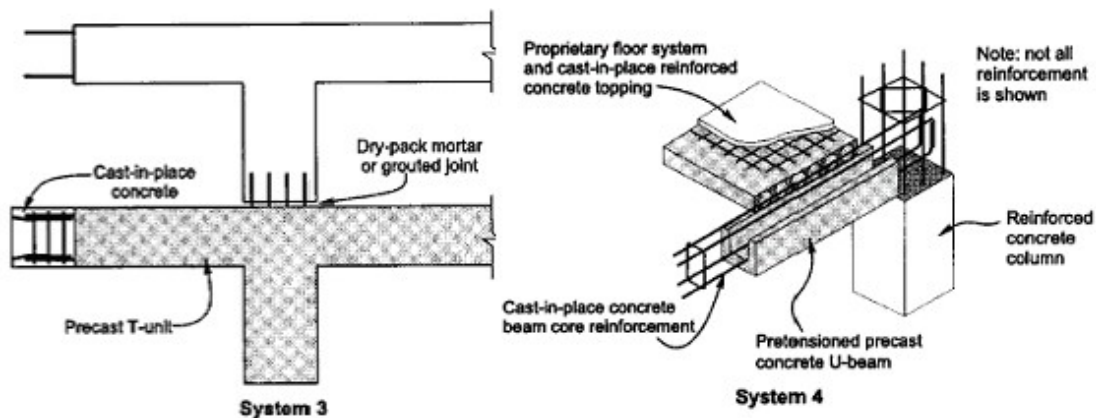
Ductile equivalent monolithic R/C moment resisting frame system, system 3, and system 4
